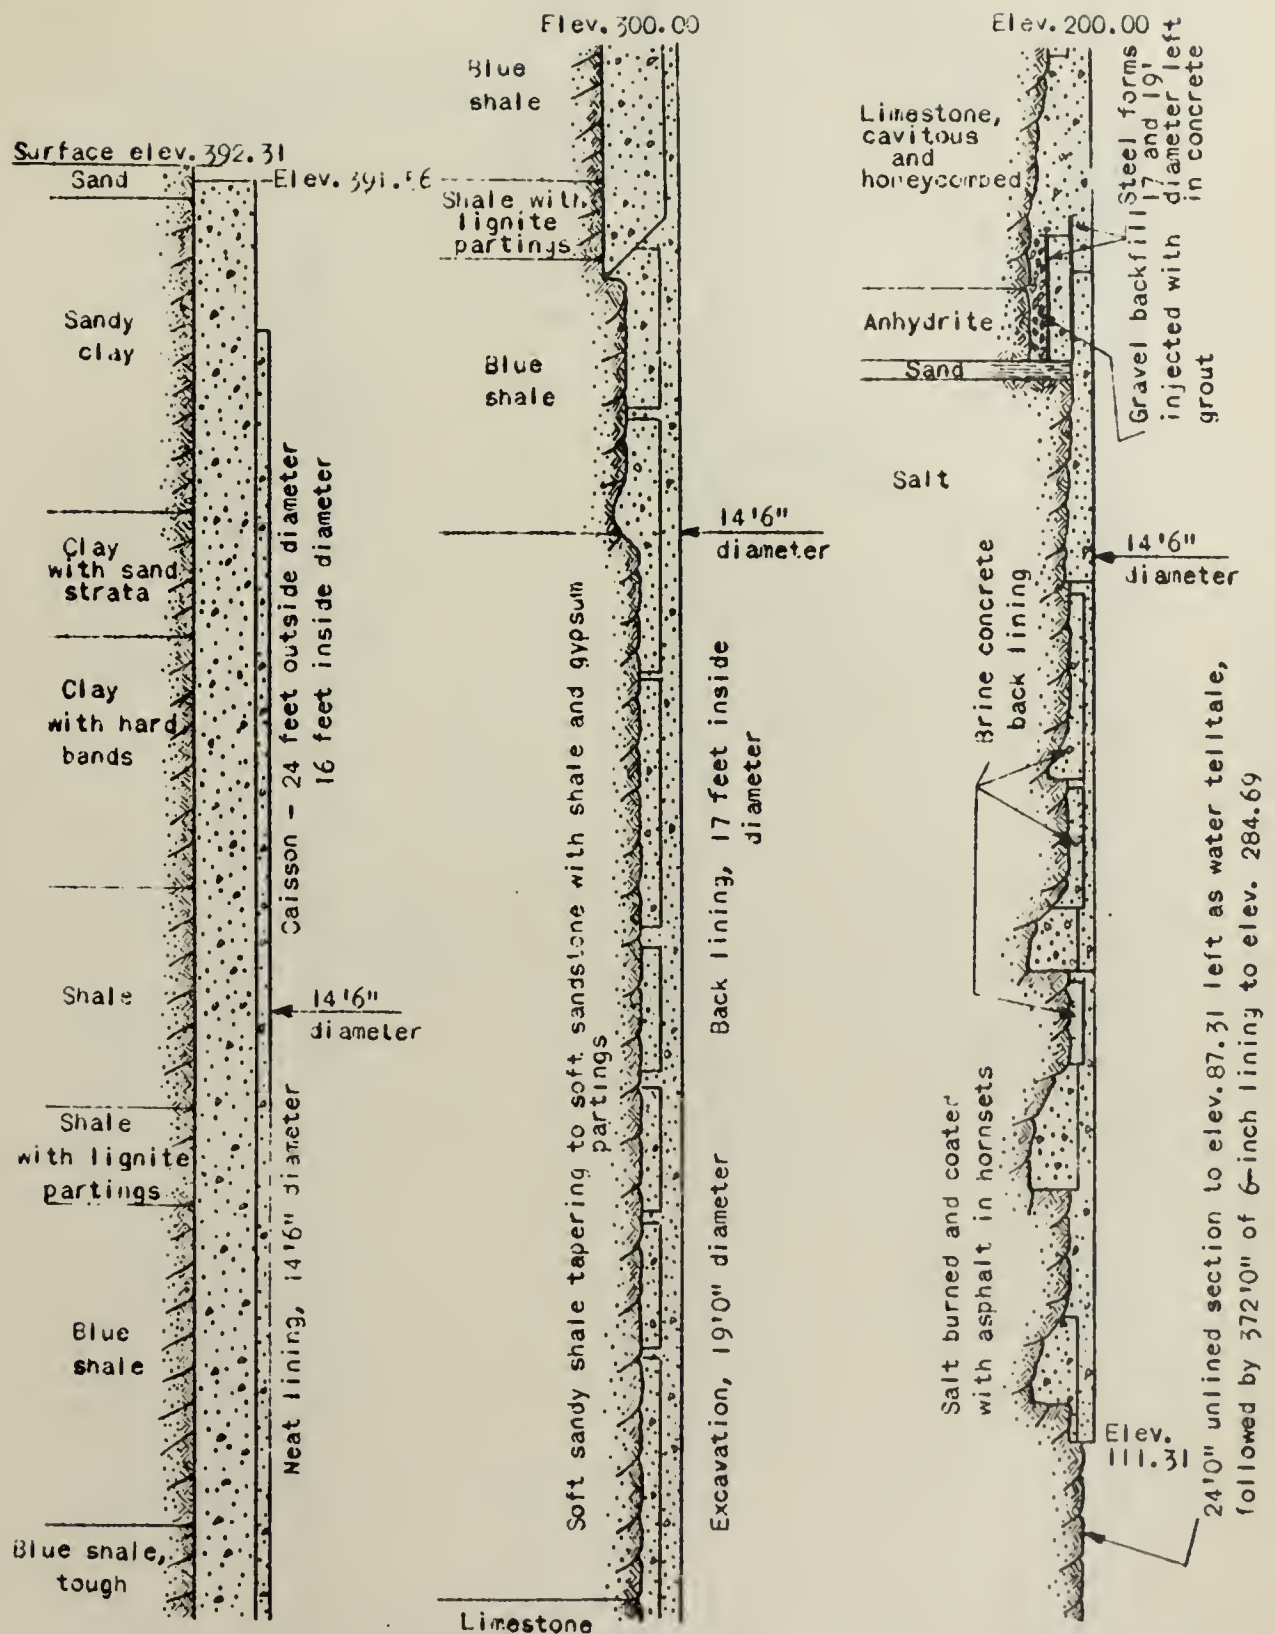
Columnar section of concrete shaft lining showing strata encountered
